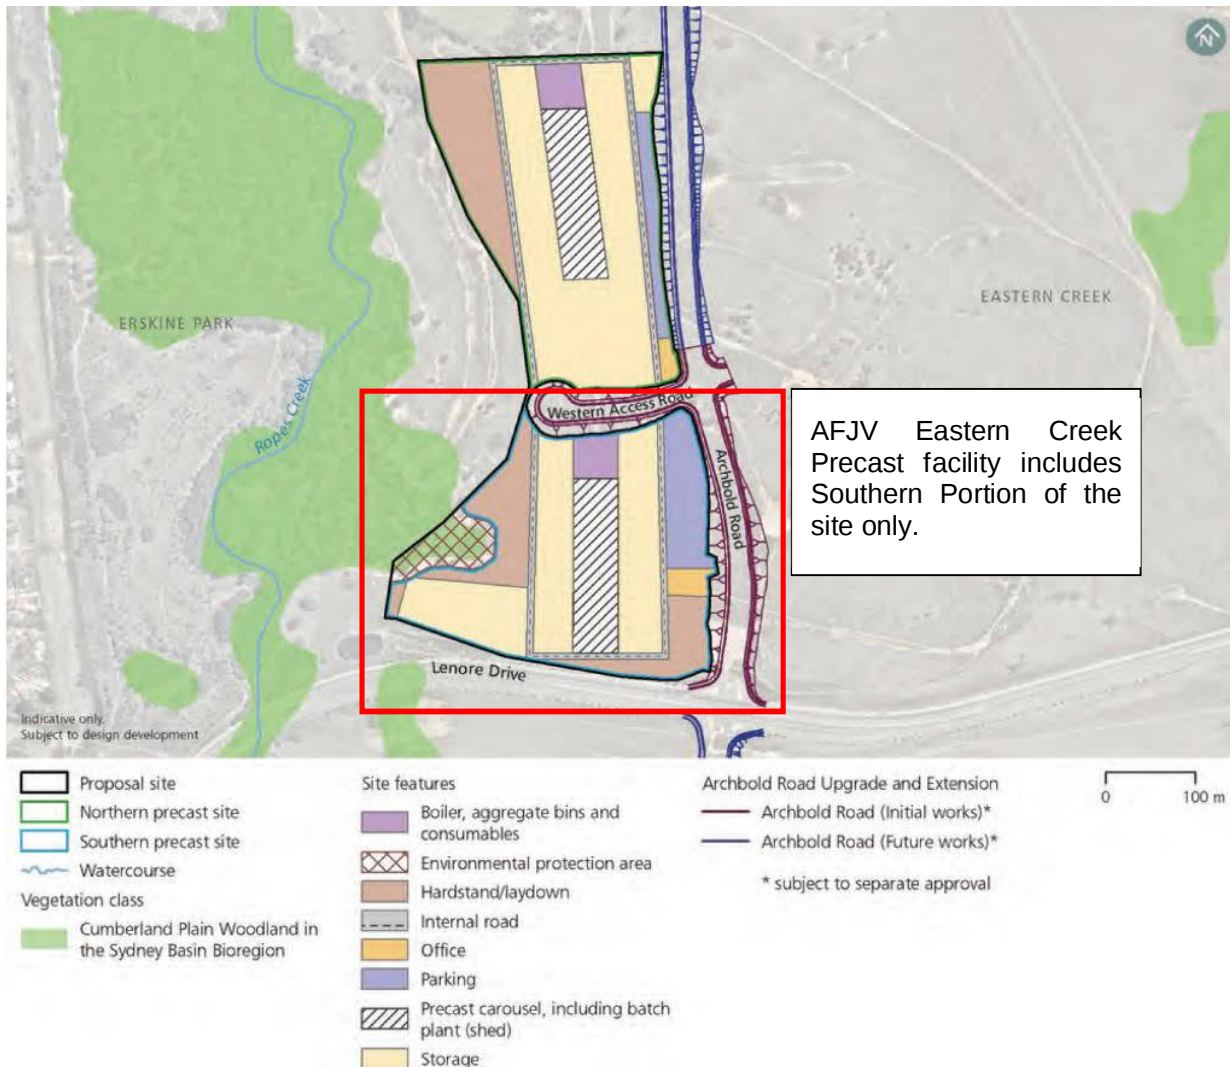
EASTERN CREEK PRECAST FACILITIES INDICATIVE SITE LAYOUT
